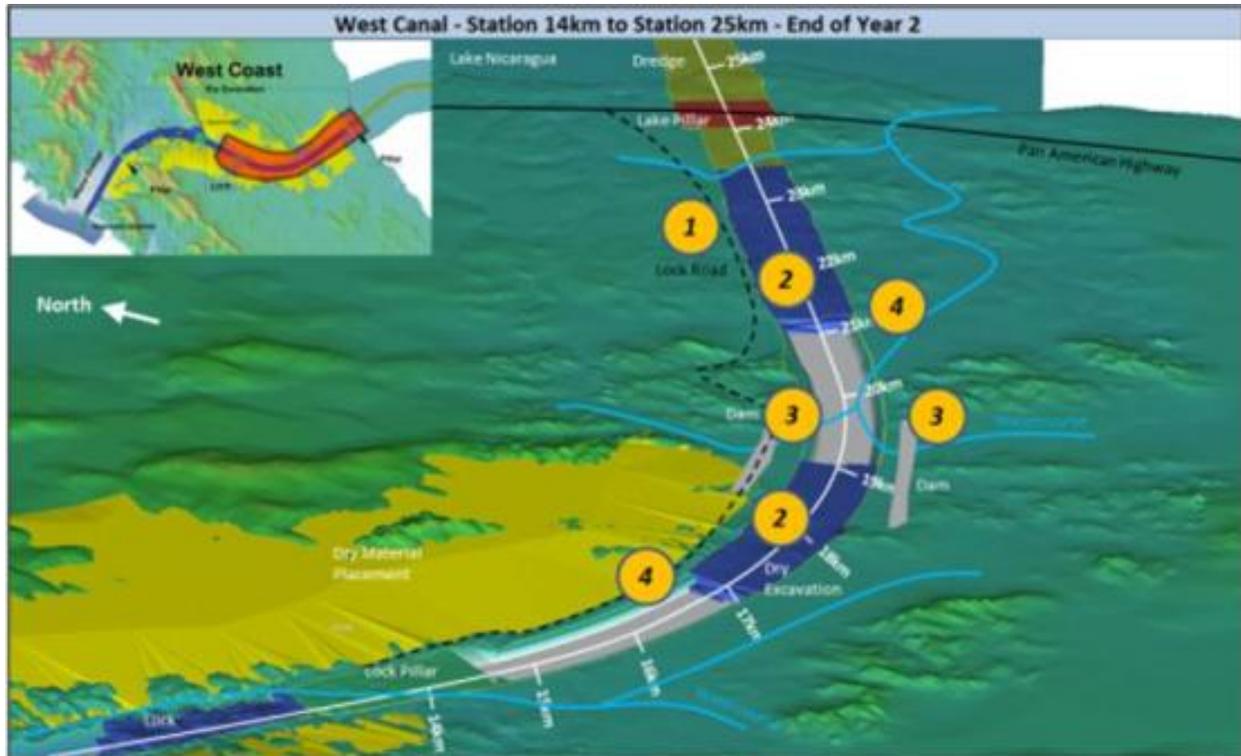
Year 2 West Canal Activities between Stations 14 and 25 Kilometers
